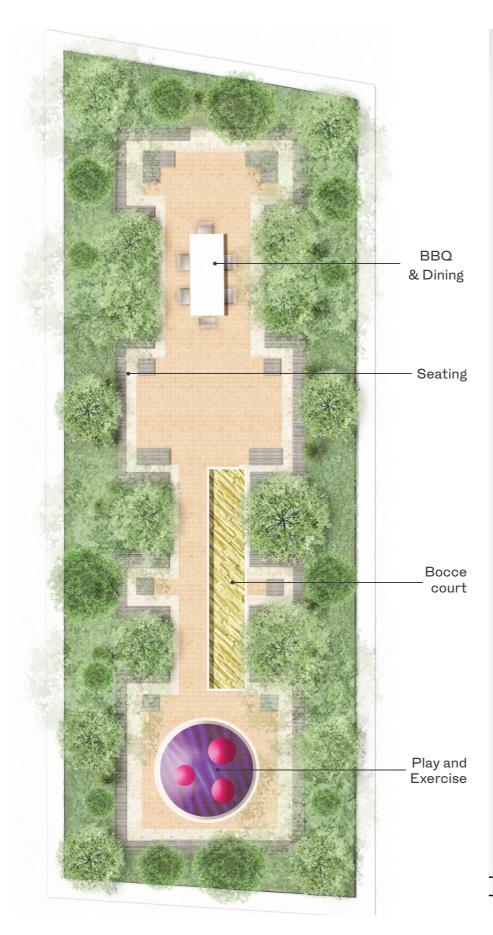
Typical Roof garden rendered view - seating area and BBQ
